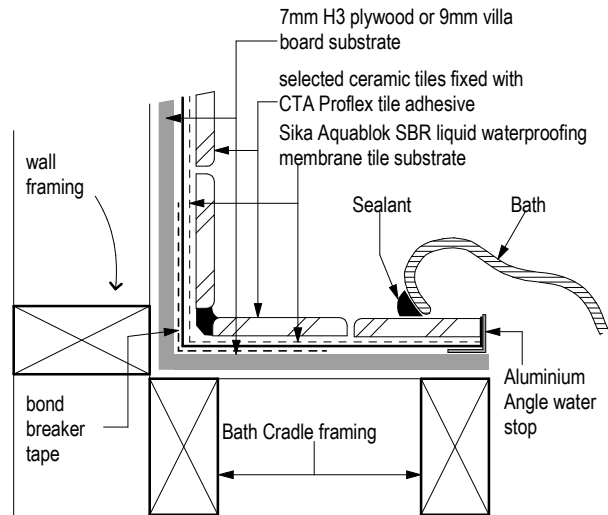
Baths, Basins, Tubs and Sinks, Joints against Wall Linings
